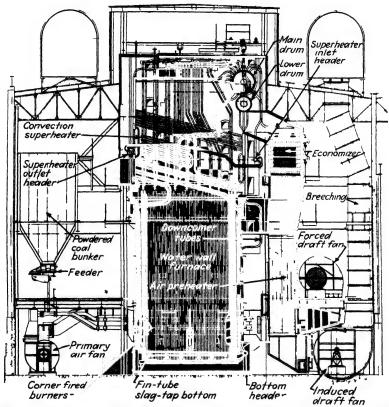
Section through 300,000-lb per hr, 1,400-lb pressure, CE sectional header boiler at Firestone Tire and Rubber Company, Akron Ohio This unit is fired by pulverized coal and has a slagging type of furnace ((ombustion Engineering Company, Inc.)
